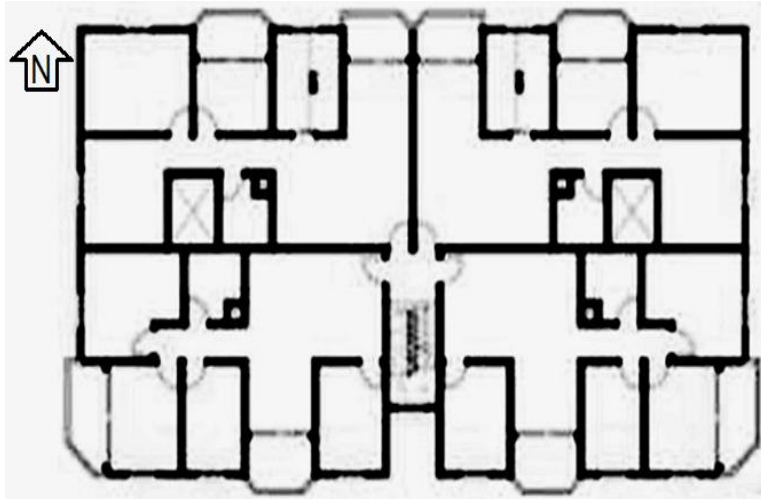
Ground Floor Plan of Haci Ali Multi-Story Apartment
